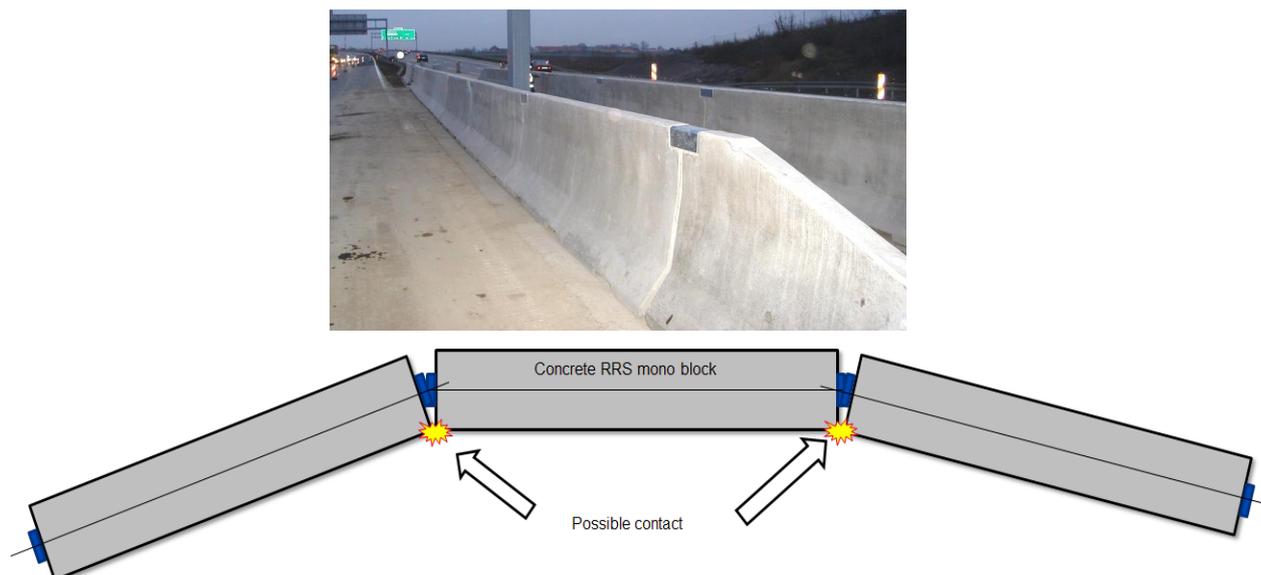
Example of typical concrete road barriers and its deflection mechanism
